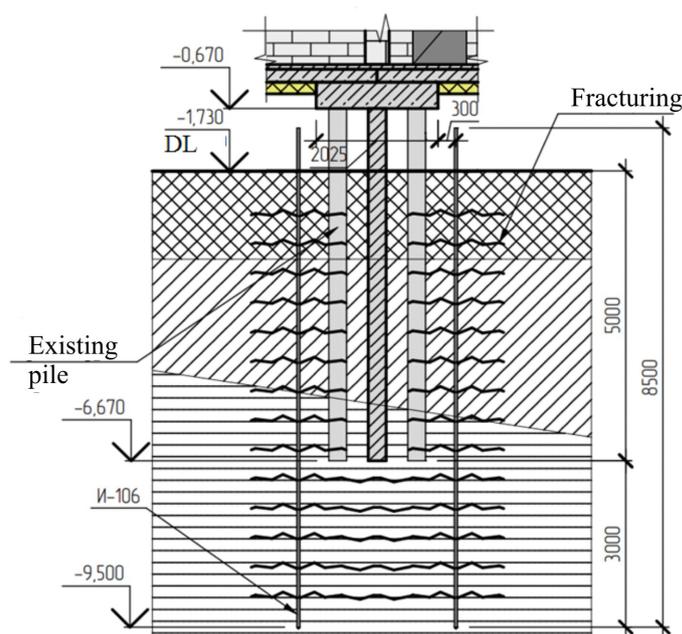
Scheme of the pile foundation reinforcement by cementation according to wristband-pipe injection technology
